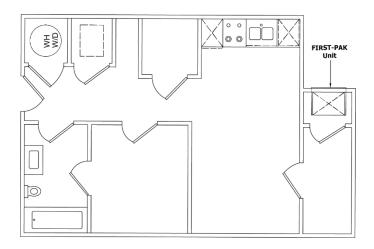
Typical Floorplan With First- Pak On Exterior Wall
